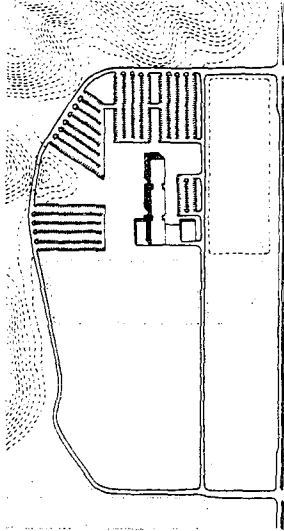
SCHEME 3-A/SITE PLAN
